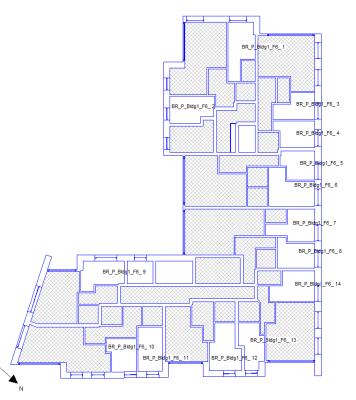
Level 6 bedrooms in Building 1 (larger plan in Appendix A)
